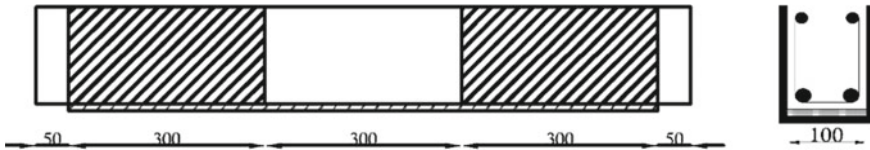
Schematic diagram of strengthening pattern followed in the beams specimens
